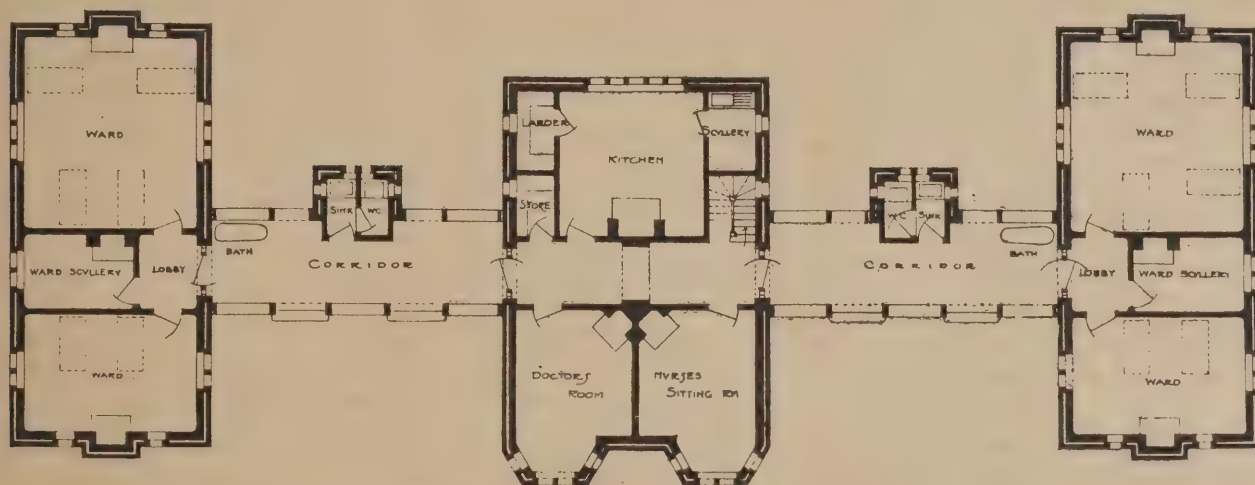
PLAN OF FUTURE HOSPITAL. MESSRS. BUTTERWORTH AND DUNCAN, ARCHITECTS.
